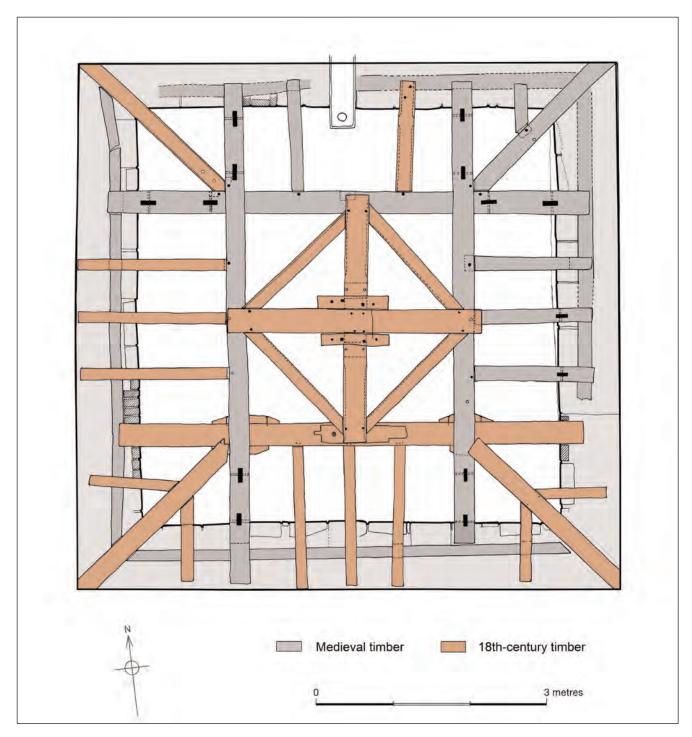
Tower. Plan of the existing roof structure. Post-medieval timbers are shown in outline. For a detailed drawing of the surviving medieval components (grey-toned), see Fig. 538. Scale 1:50. Drawing: Stephen Coll
